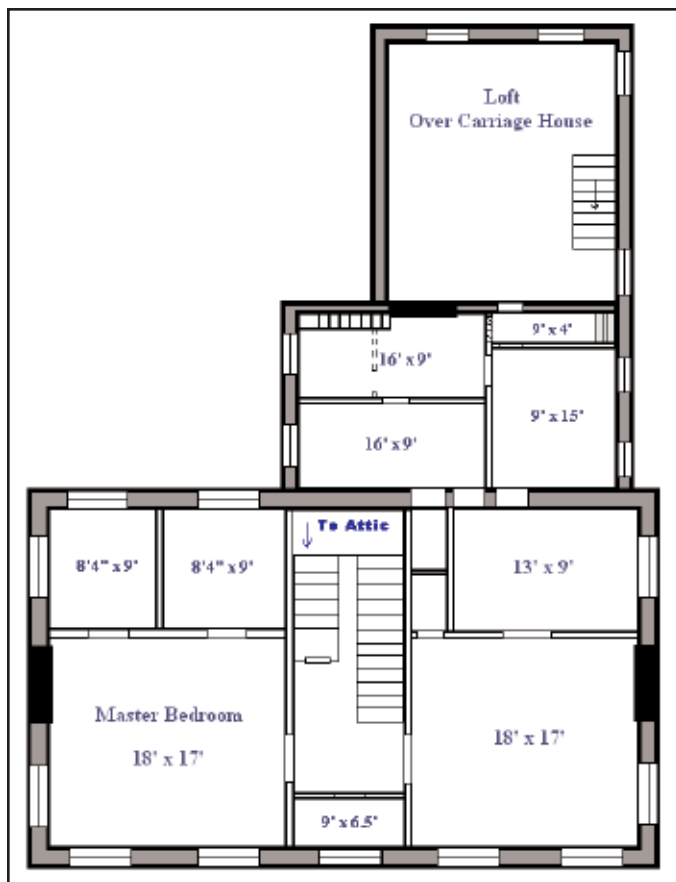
Second floor plan of the house. Ceilings are 10 feet high on this floor (Drawing by the author).
